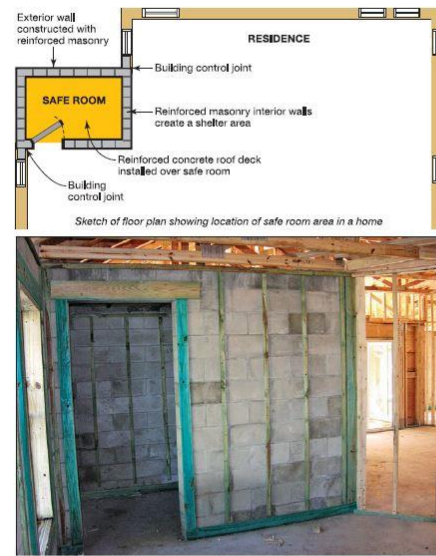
In-home safe room under construction; the CMU walls of the safe room are fully grouted and vertically reinforced with steel reinforcing bars from the foundation to the concrete roof deck (New Smyrna Beach, FL, 2007)
